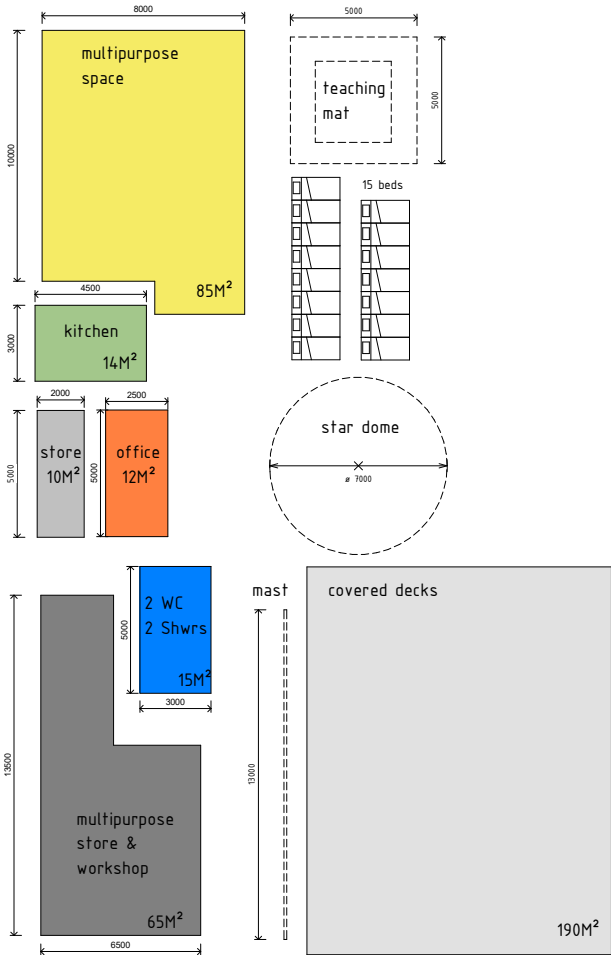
Spatial allocation plan following briefing, wānanga and concept design testing - WALA Feb 2025
